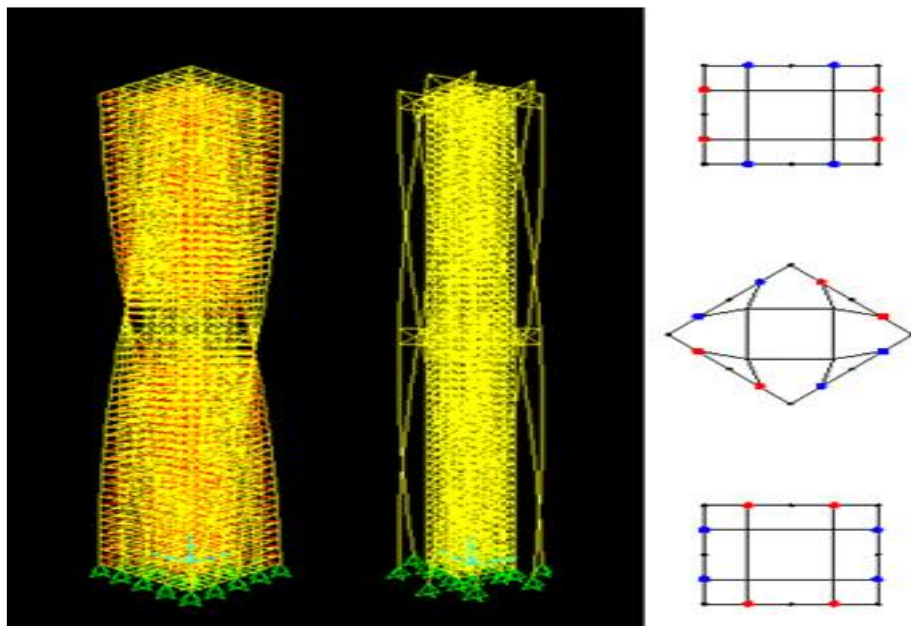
Outrigged Twisted 60 Storey Building with 1.5 Degree Twist Per Storey
